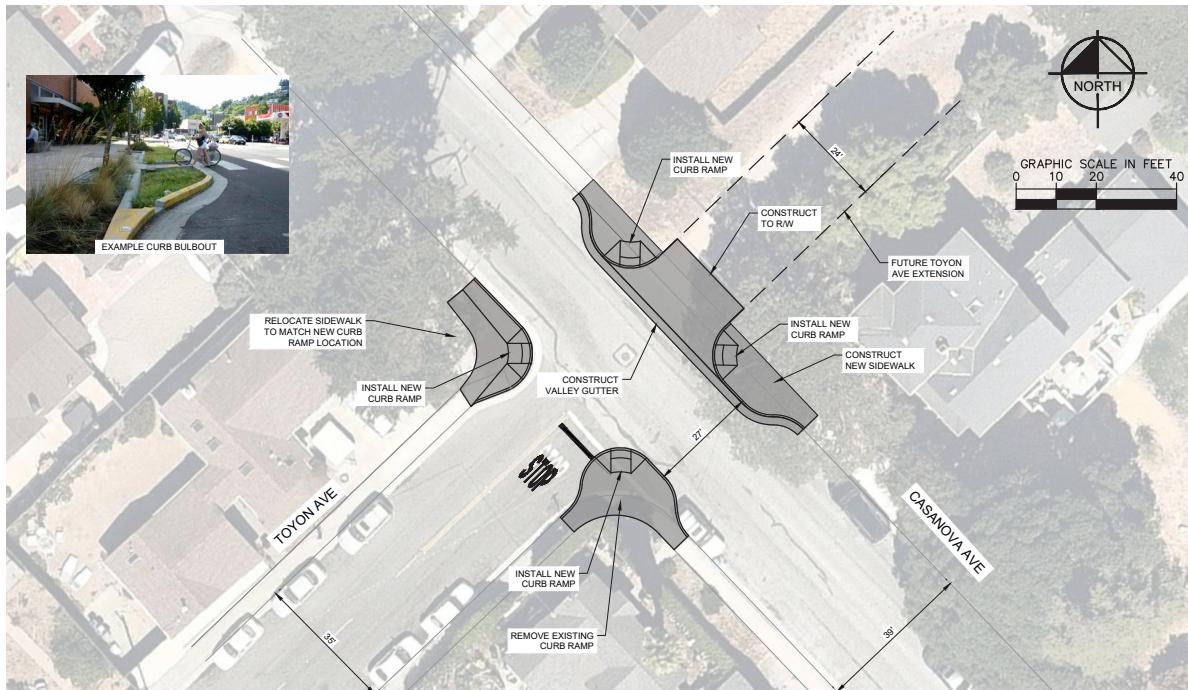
Casanova Avenue and Toyon Avenue Curb Extension/ Bulbouts
